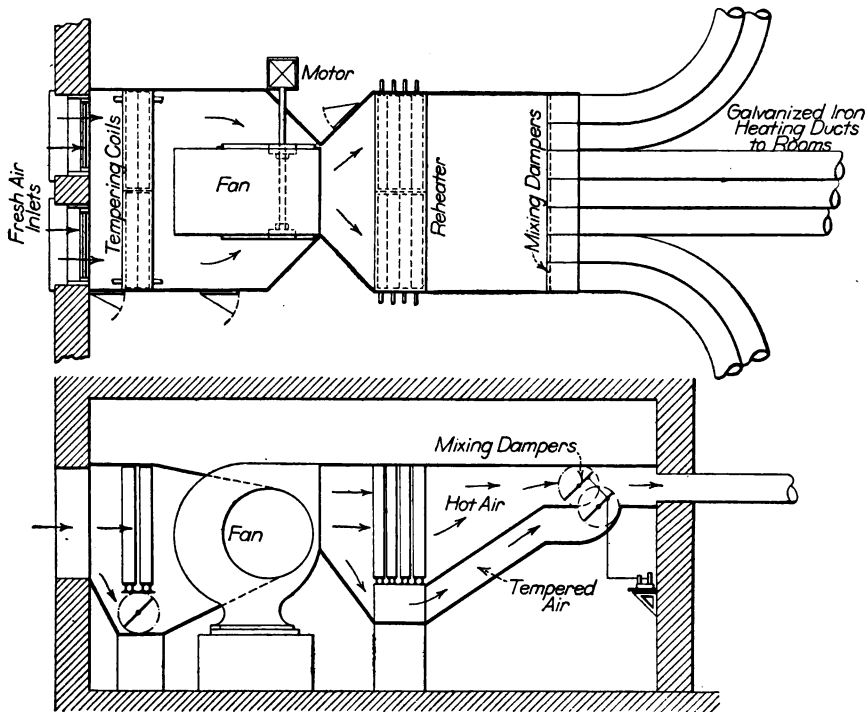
PLAN AND ELEVATION, SHOWING ARRANGEMENT FOR HEATERS AND FAN
